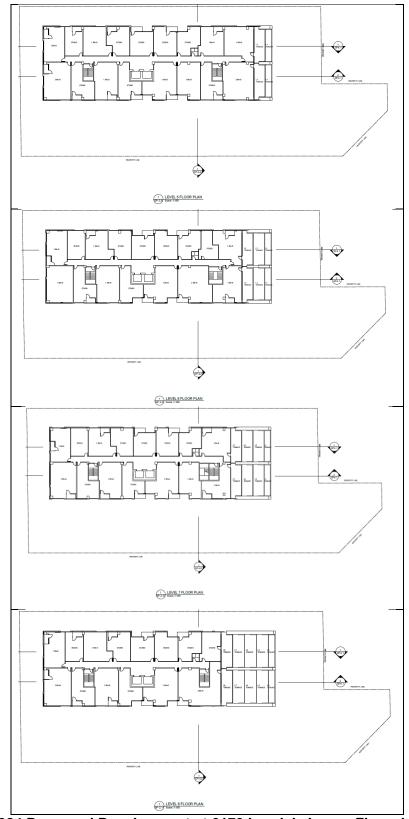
2024 Proposed Development at 6179 Lundy's Lane - Floorplans of FI 5-8 (CY Lee Architects Ltd. 2024a)
